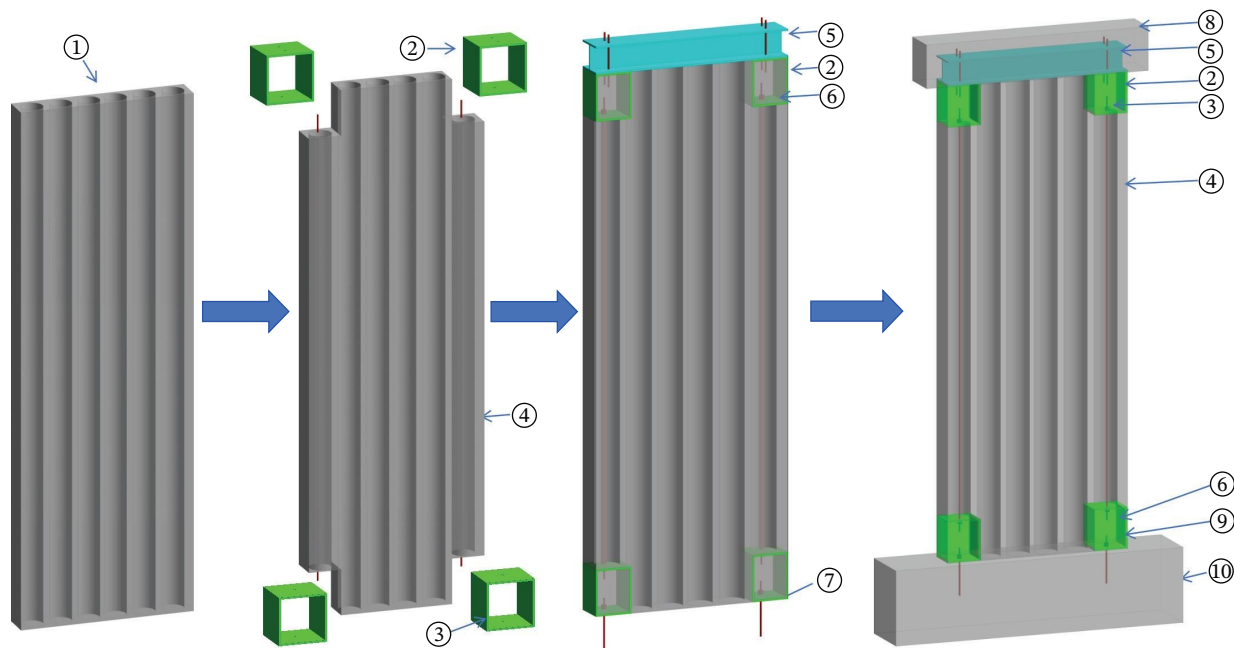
| Joint connection scheme. ① Prefabricated hollow plate, ② steel box, ③ jack reinforcement, ④ prefabricated hollow plate after cutting, ⑤ steel beam, ⑥ concrete filling box, ⑦ bolts, ⑧ loading beams, ⑨ steel box, and ⑩ ground beams.
